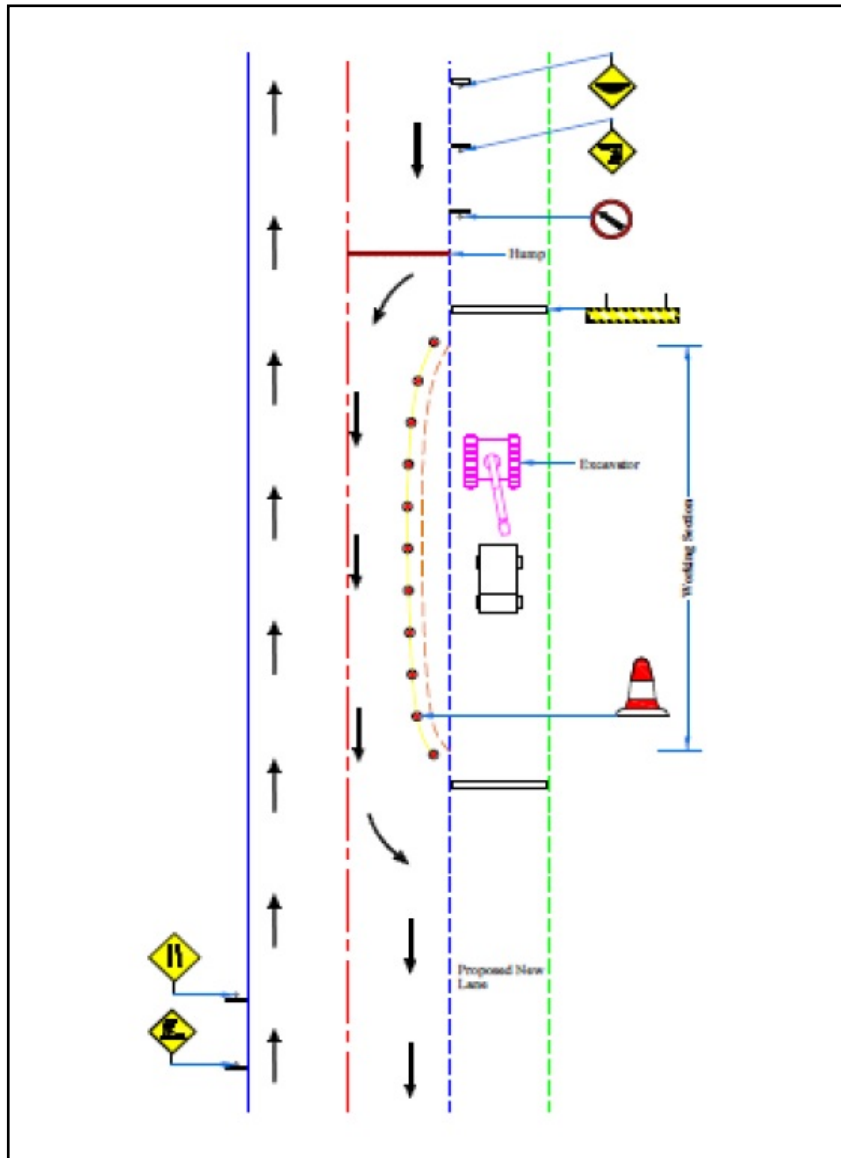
Proposed traffic management during road widening works of B084 project; phase 1
